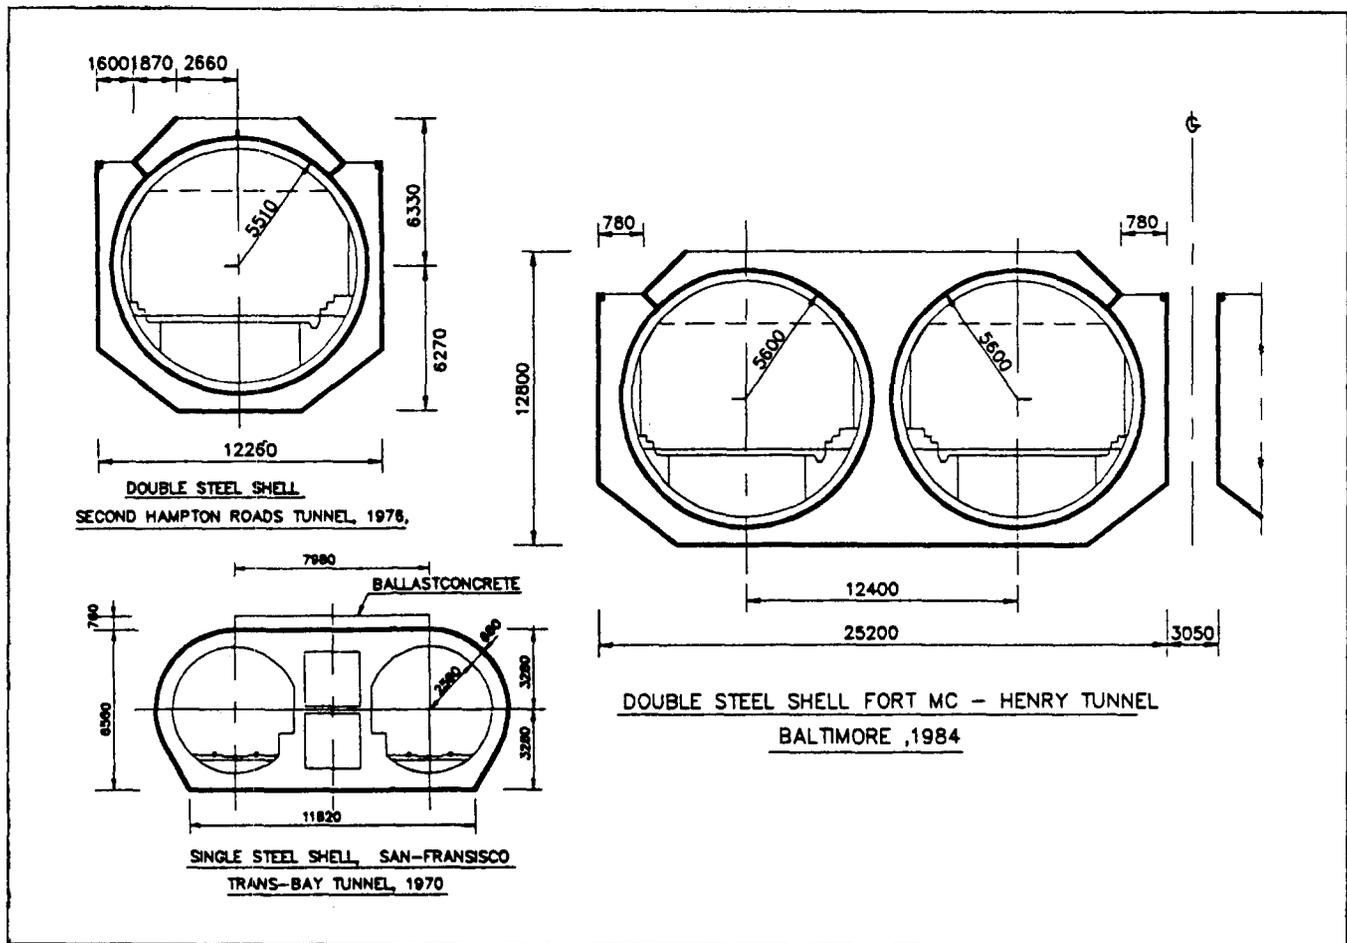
Examples of cross-sections of steel-shell immersed tunnels.
